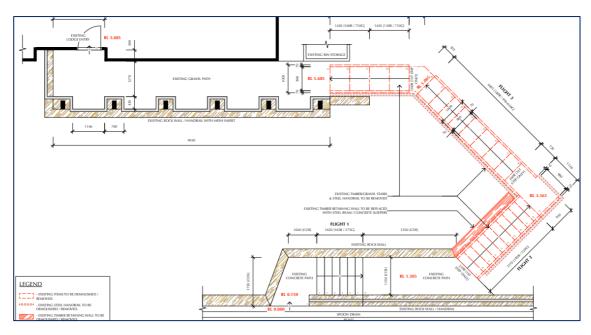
| Proposed demolition works (Source: Applicant's documentation)
